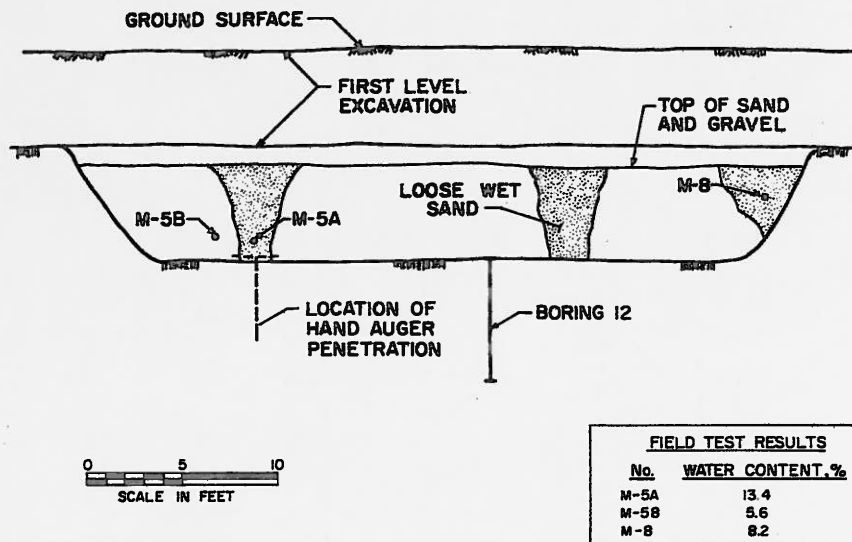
PROFILE THROUGH TEST PIT SHOWING EAST FACE
